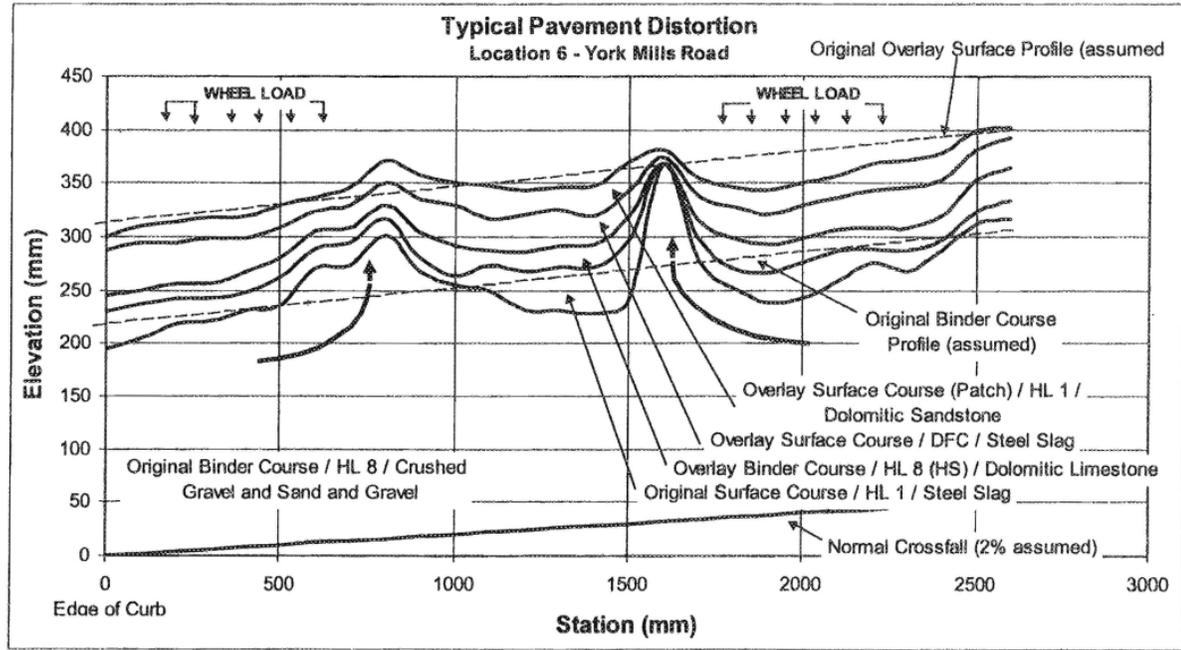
Typical Distortion of Pavement Under Repeated Overloads (Location 6 – York Mills Road)
